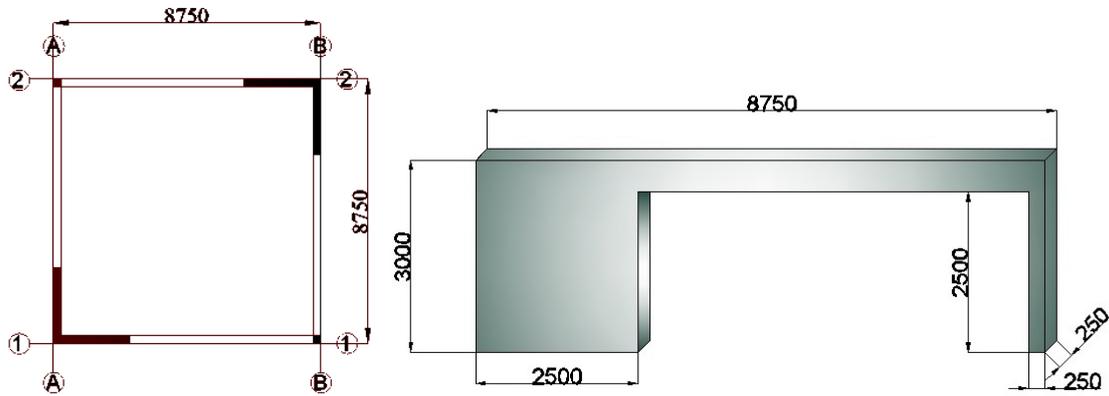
Formwork plan and geometric dimensions of axis 1 for single storey (all dimensions are in mm)
